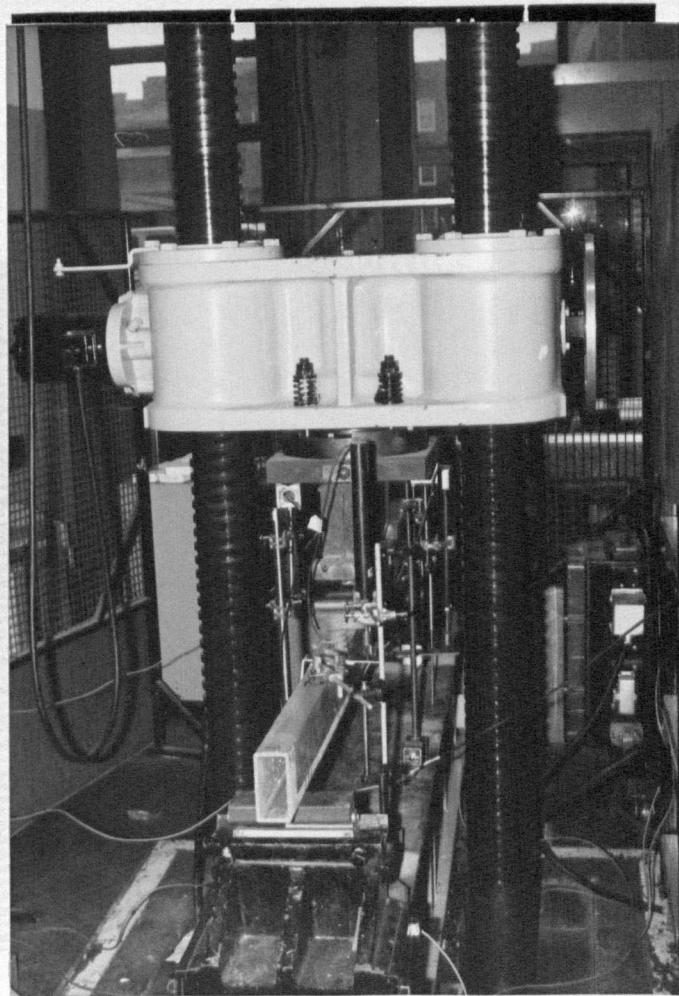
Set-up of Beam Test with 1000 *mm* Span
